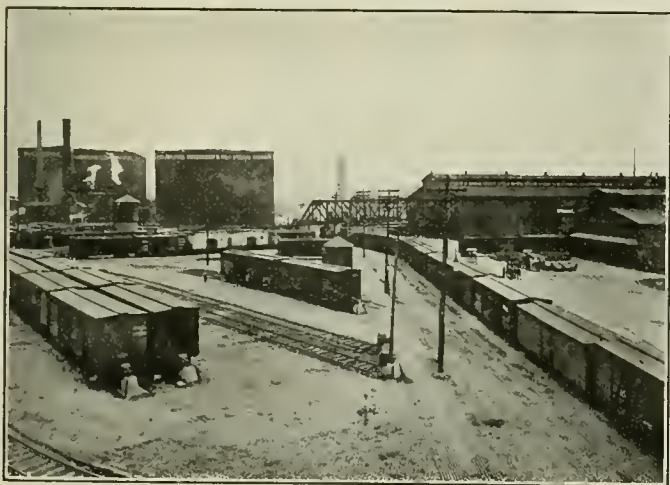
PIER NO. 27, NORTH WHARVES, PHILADELPHIA, SHOWING BRIDGE FOR SECOND-DECK TRACKS
